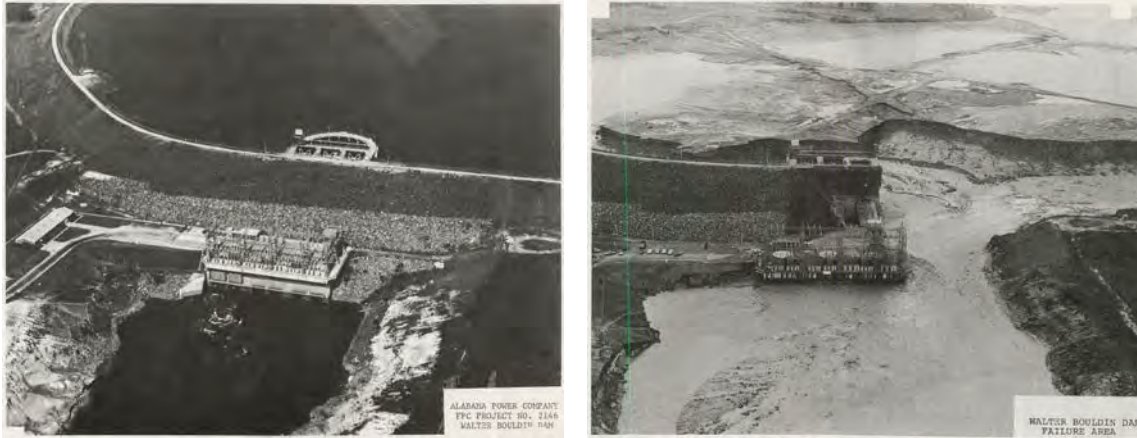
Before and after photographs of the Walter Bouldin dike failure (FERC 1978).
